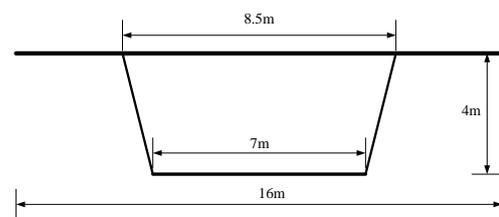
dimensions of trapezoidal cross section of steel-concrete composite box girder
